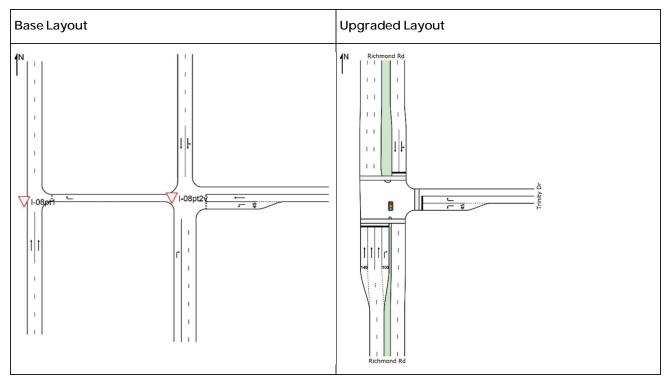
2031 with Links Road extension - Richmond Road/Trinity Drive
